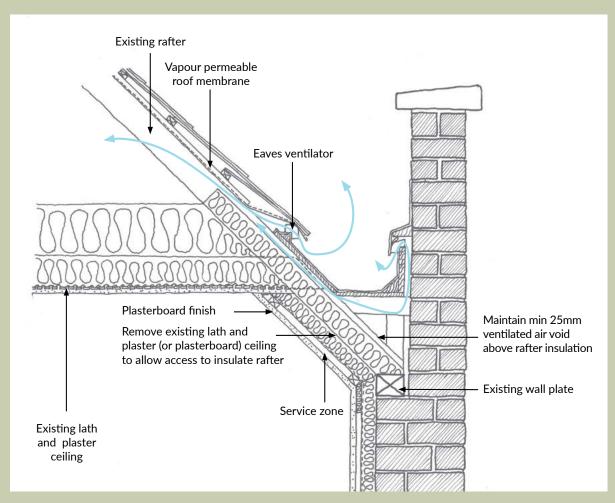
A hybrid system combining horizontal insulation at ceiling level and pitched insulation at rafter level to the sloped section of ceiling can also be used
